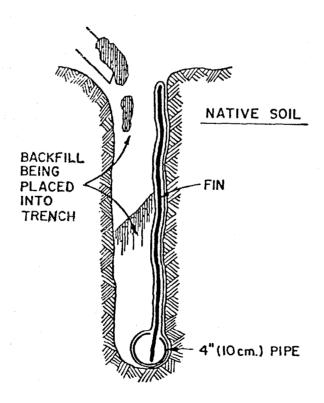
Installation of Prefabricated Fin Drain in Trench (101)
